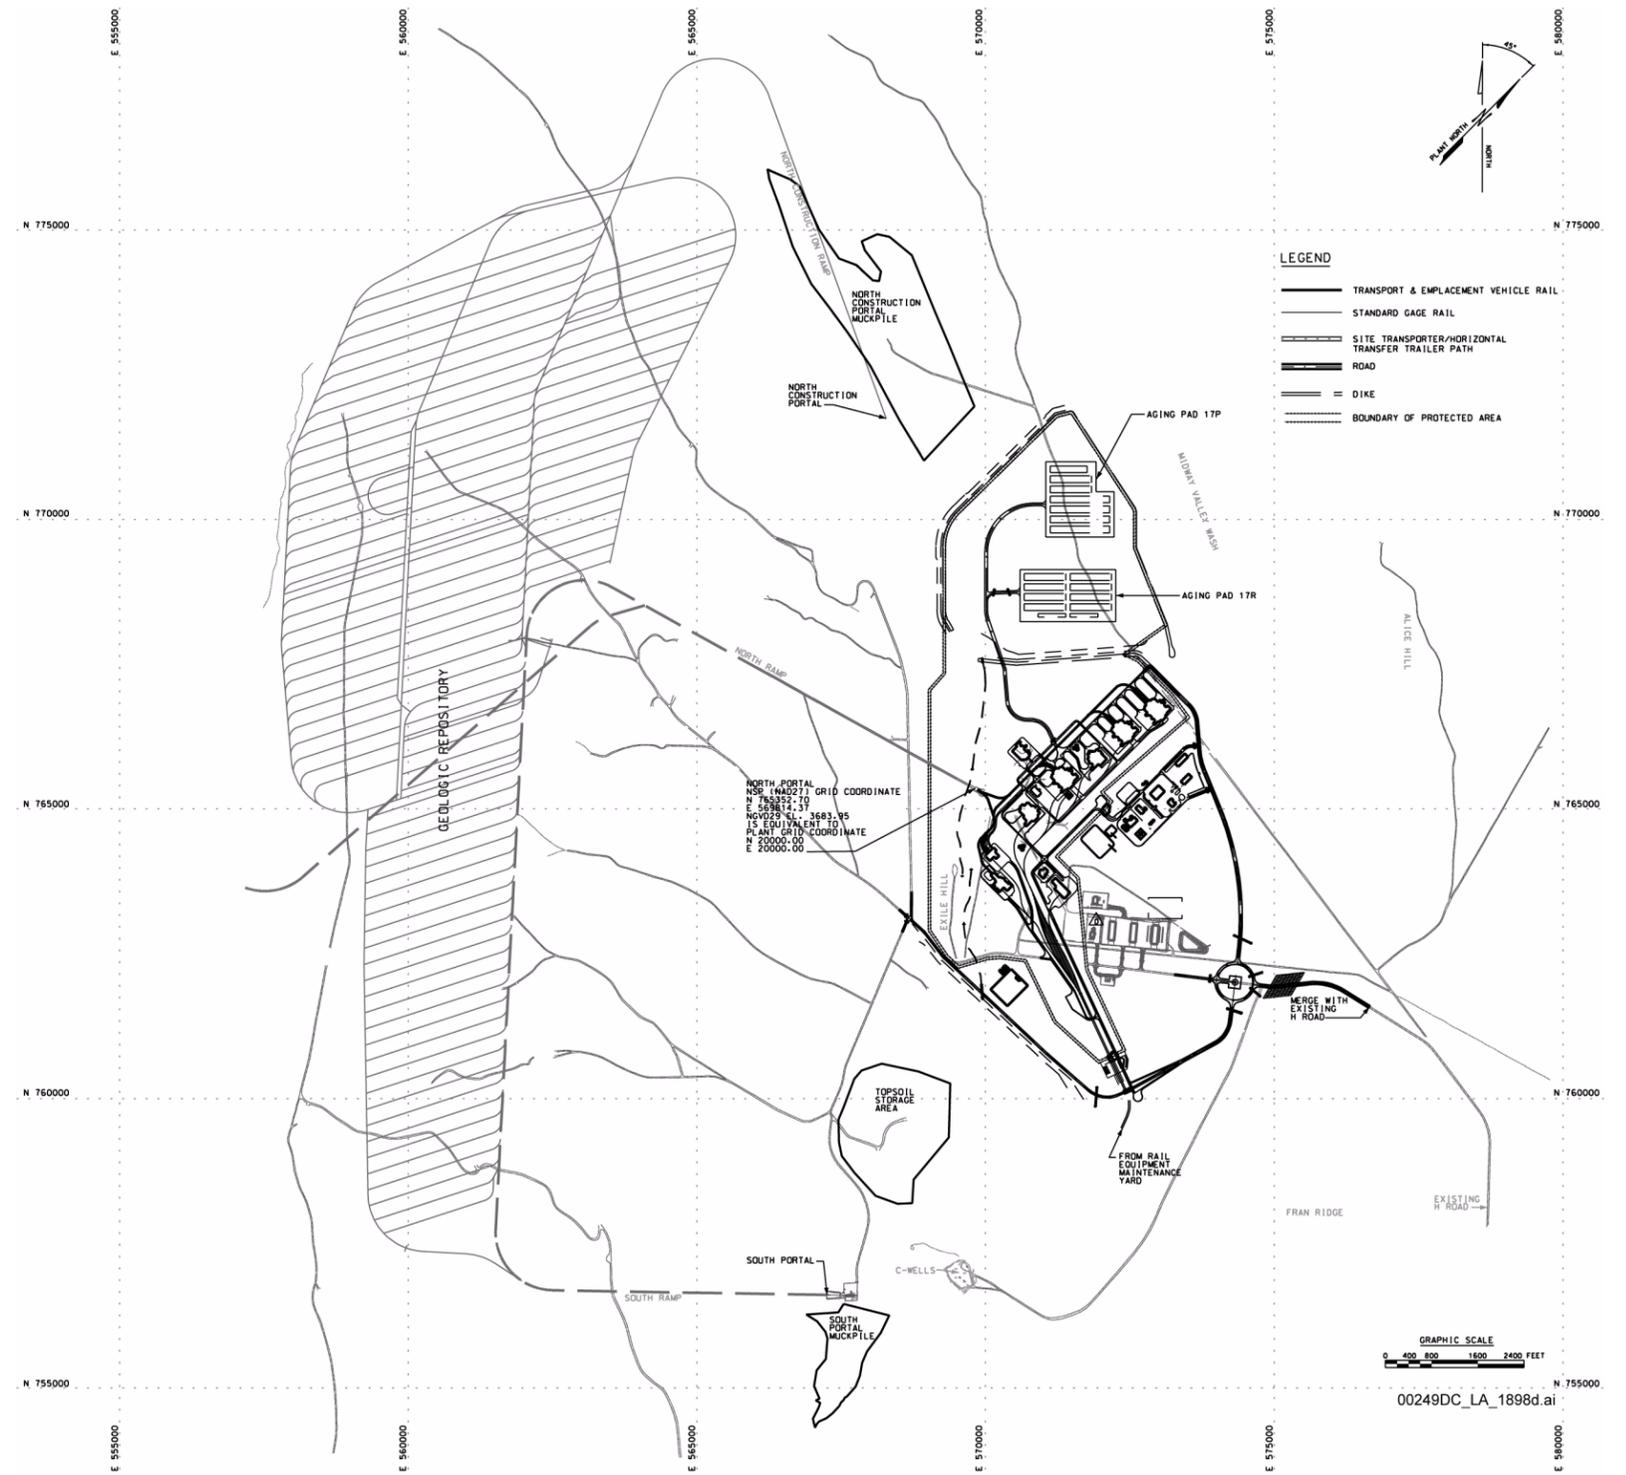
Geologic Repository Operations Area Site Plan
